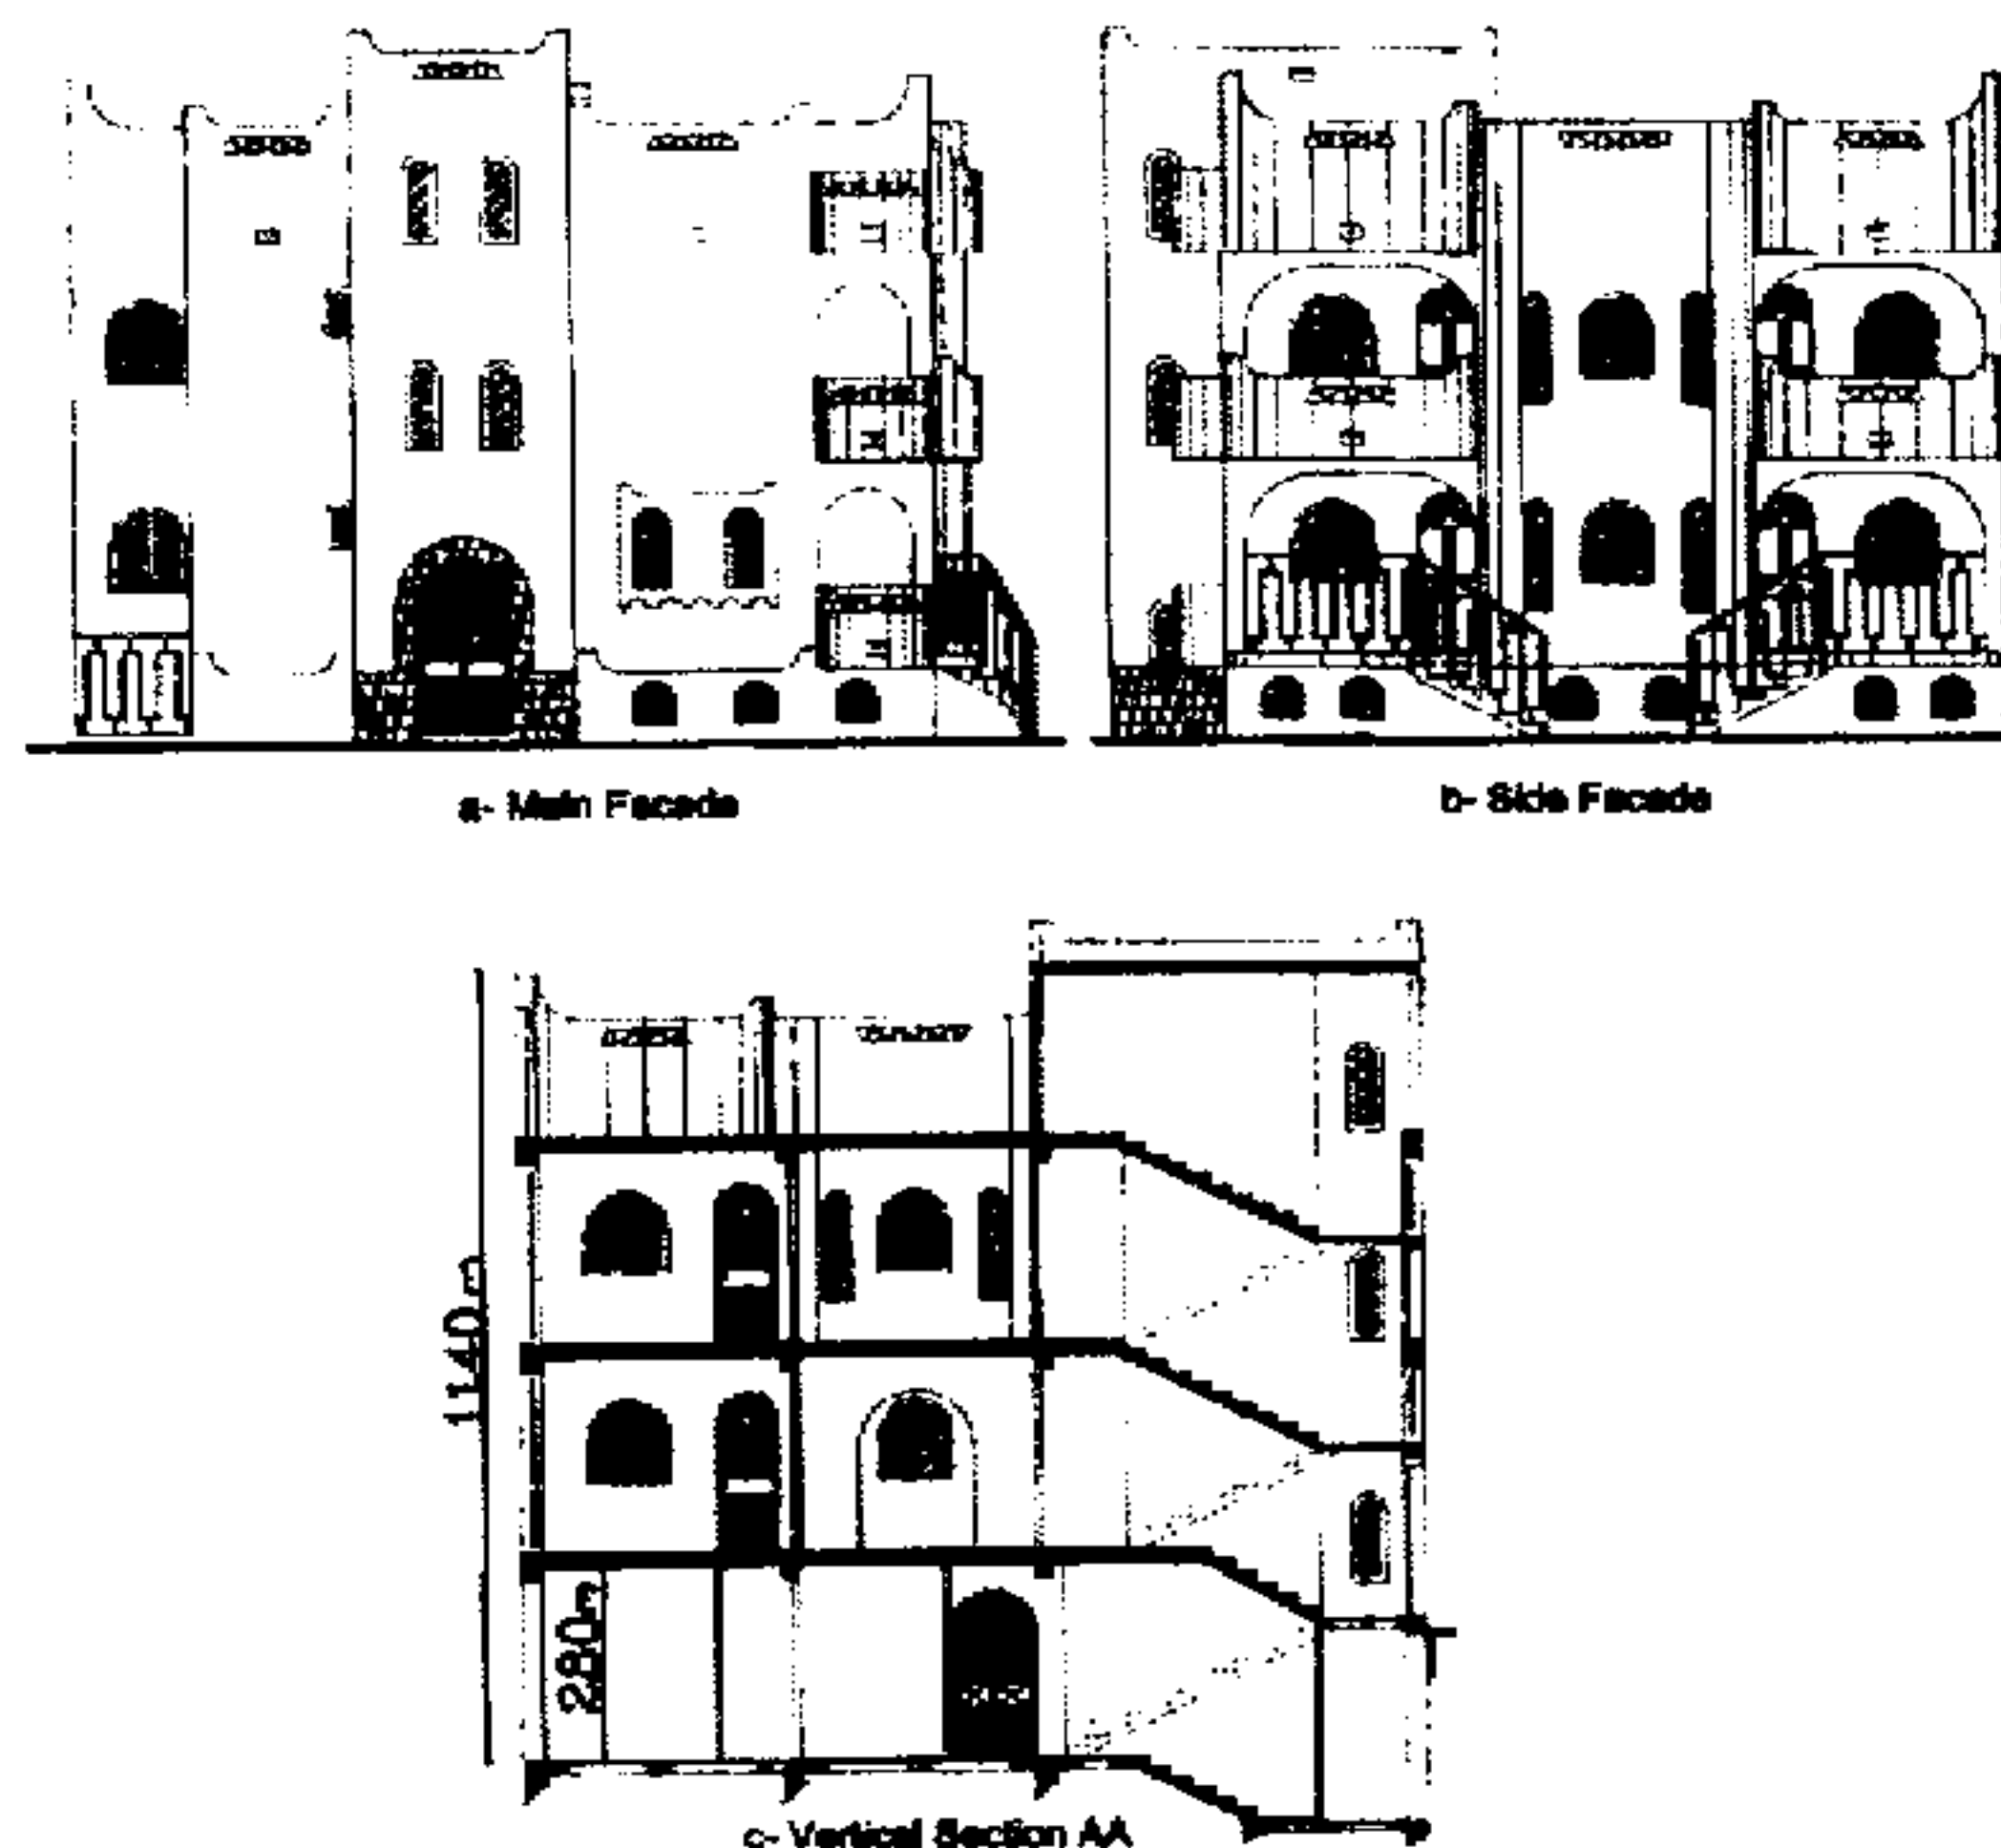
Typical elevations produced by professionals (a: main façade, b: side façade, c: vertical section).
